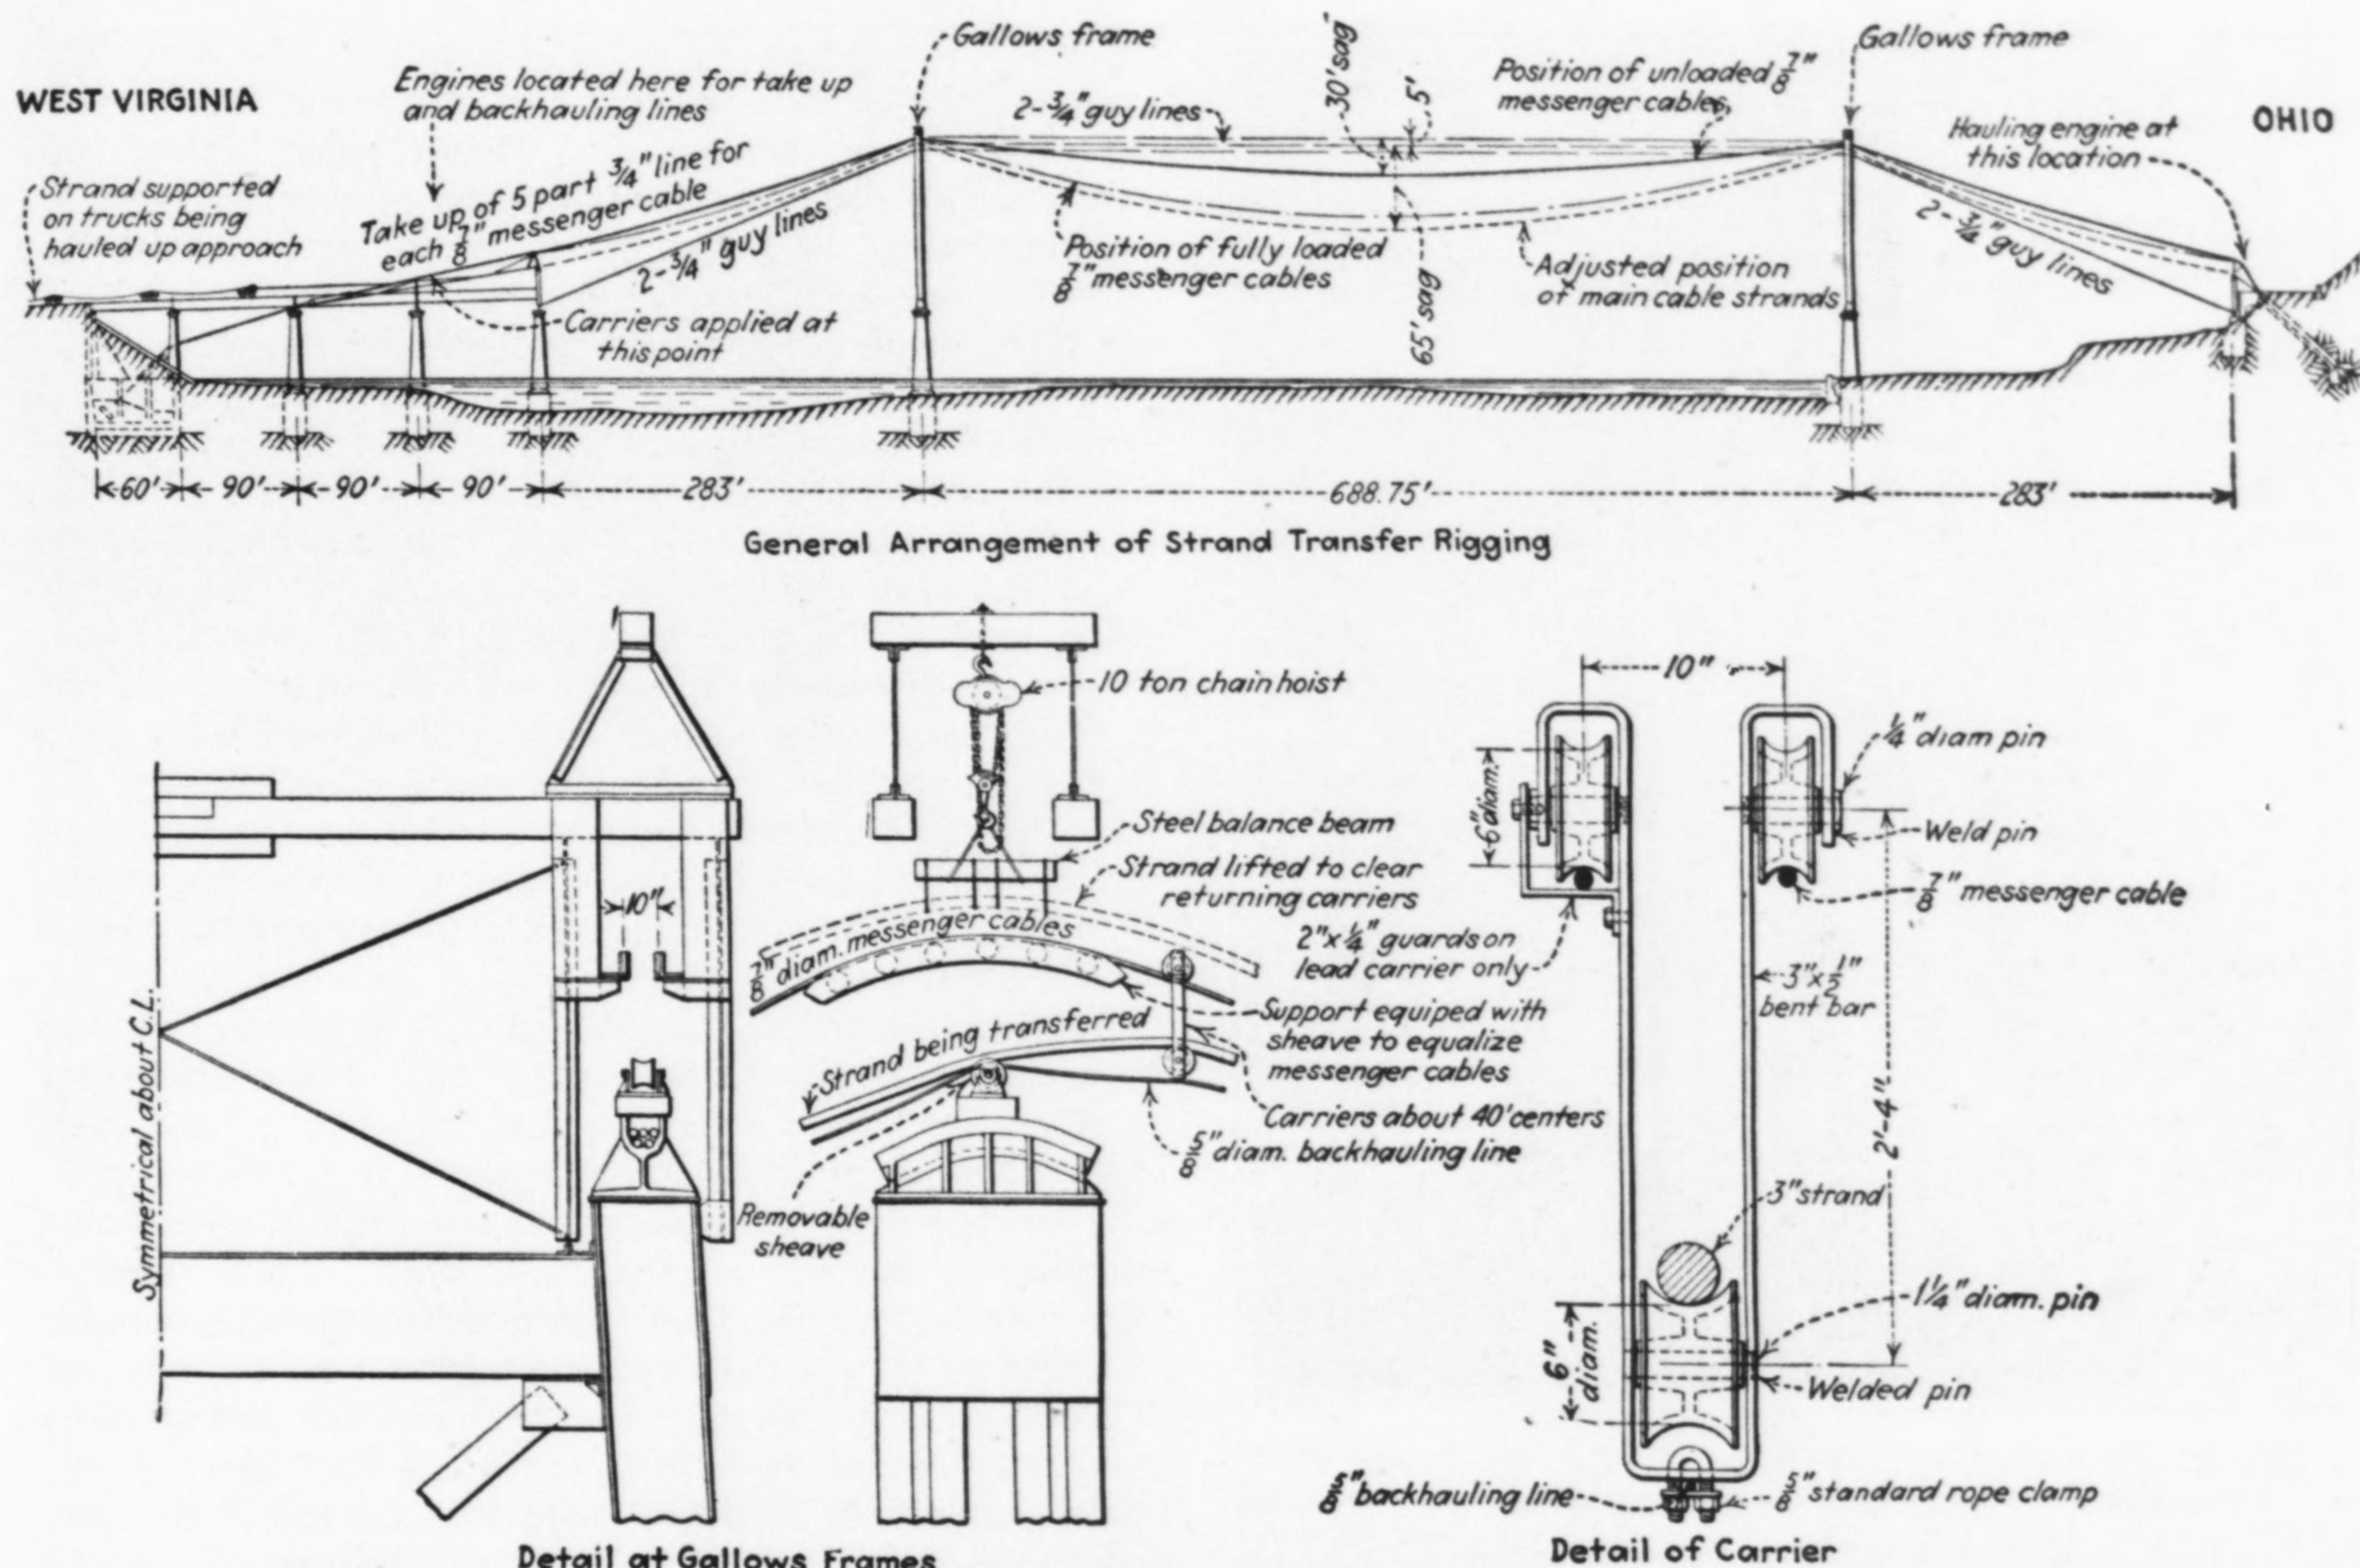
ARRANGEMENT AND DETAILS OF RIGGING FOR TRANSFERRING CABLE STRANDS FROM SHORE INTO POSITION ON TOWERS
